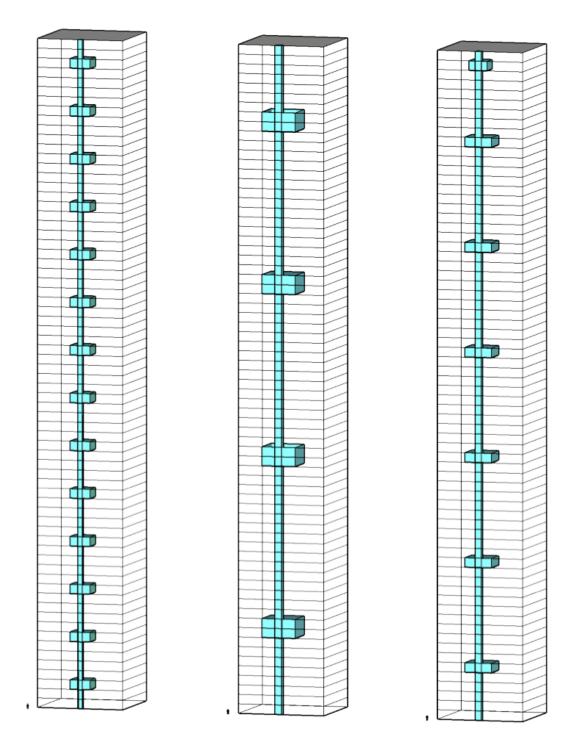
Building 2 with the three ventilation configurations for waterborne cooling at 30 W/m<sup>2</sup>. Marked in blue is the plant rooms and ventilation ducts. A person is placed at the bottom left of each building for scale.
